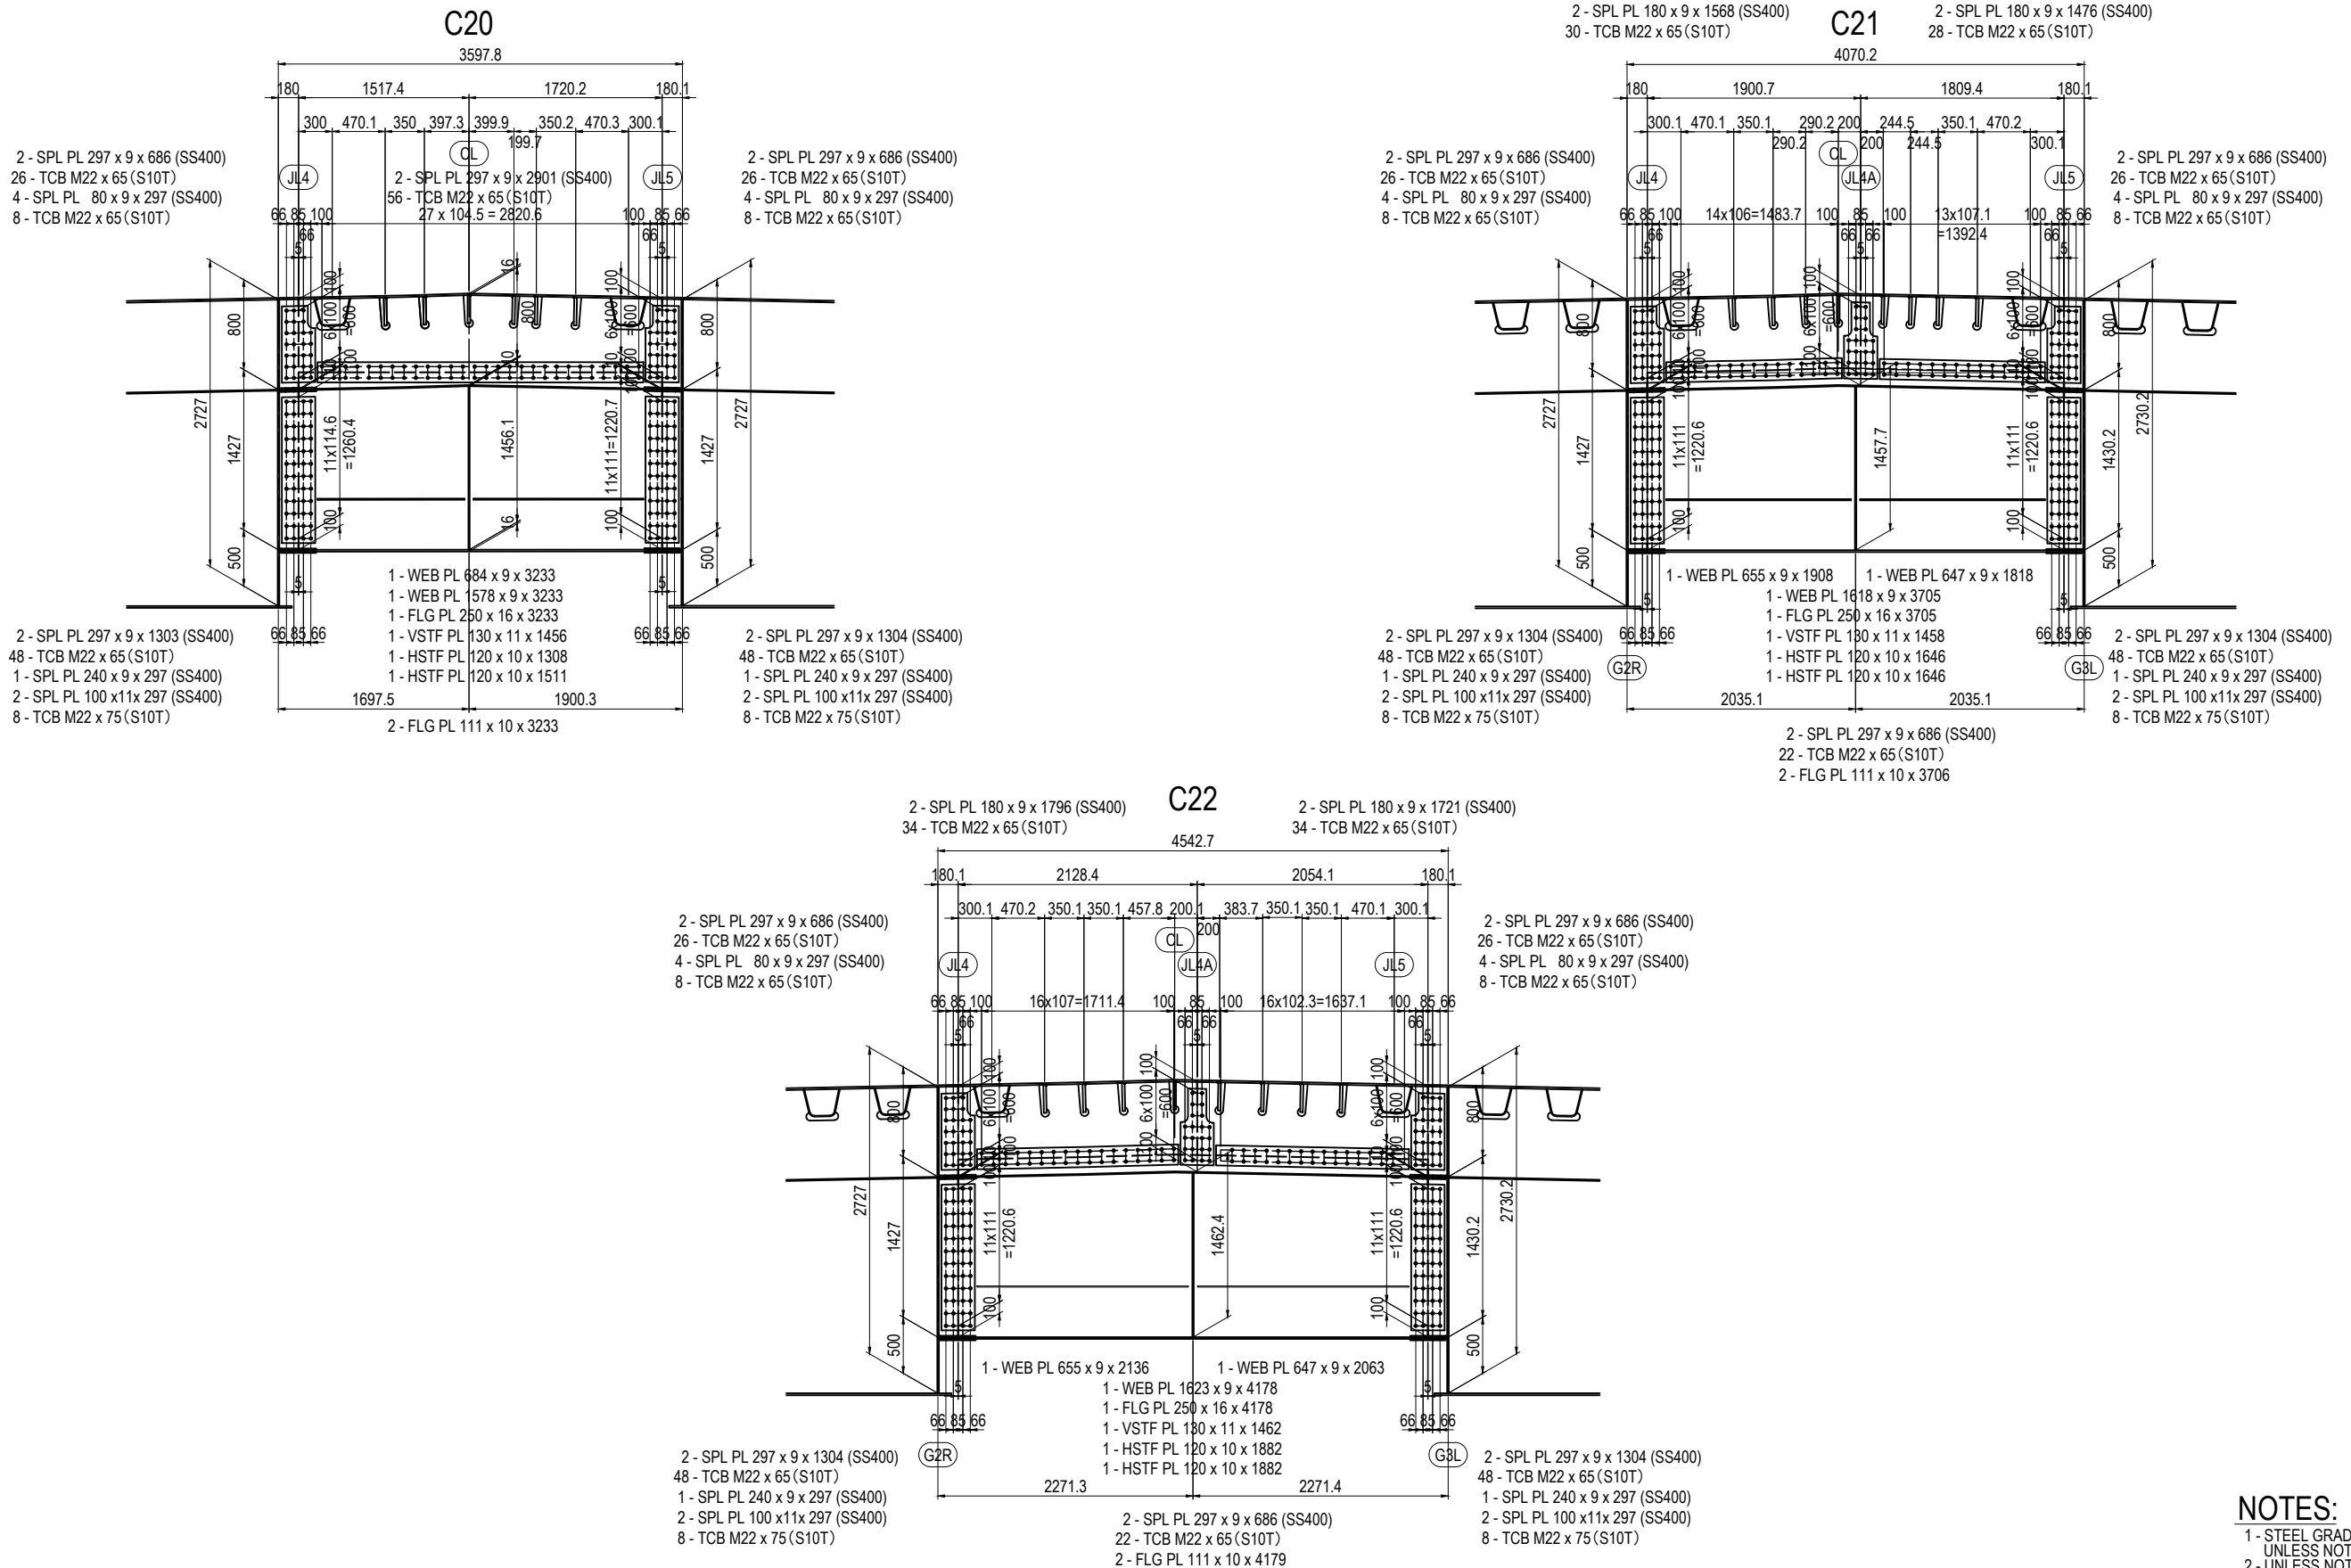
DETAIL OF CROSS GIRDER SECTION (12) S=1:60 C19 TO C24 (1)
